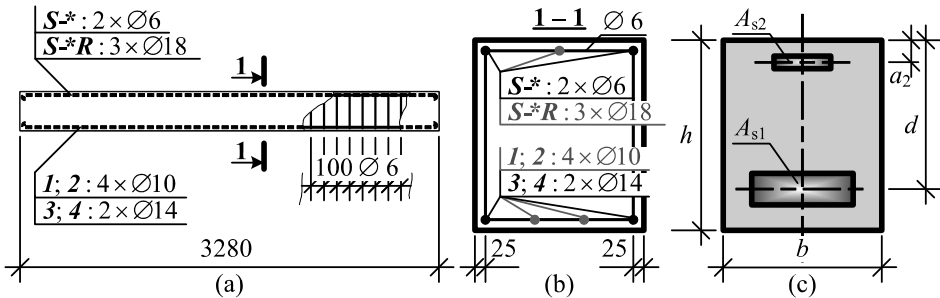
Longitudinal (a) and cross-sectional (b) reinforcement of the beam specimens; notation of cross-section (c)
